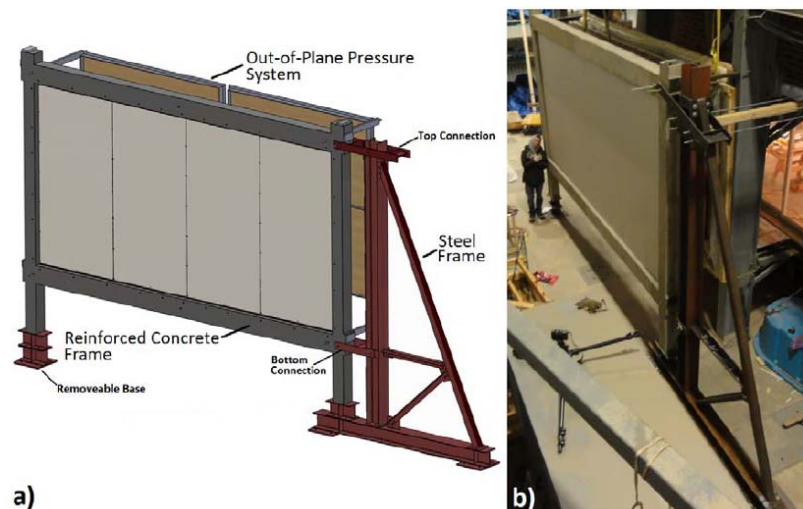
Test Apparatus a) as design b) as constructed in the lab with a 2.4m x 4.8m (8' x 16') wood panel
